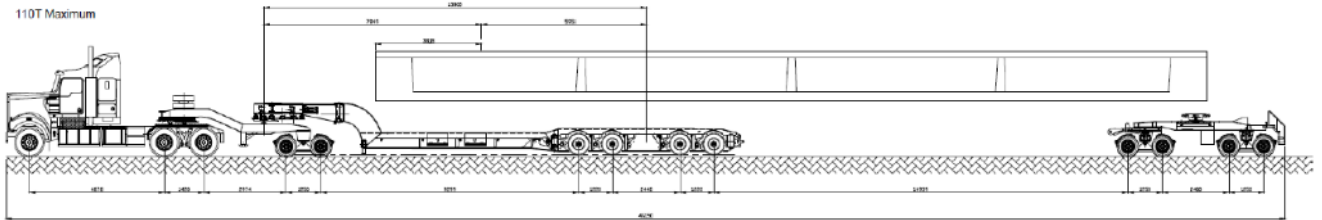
L-BEAM TRANSPORT ARRANGEMENT
